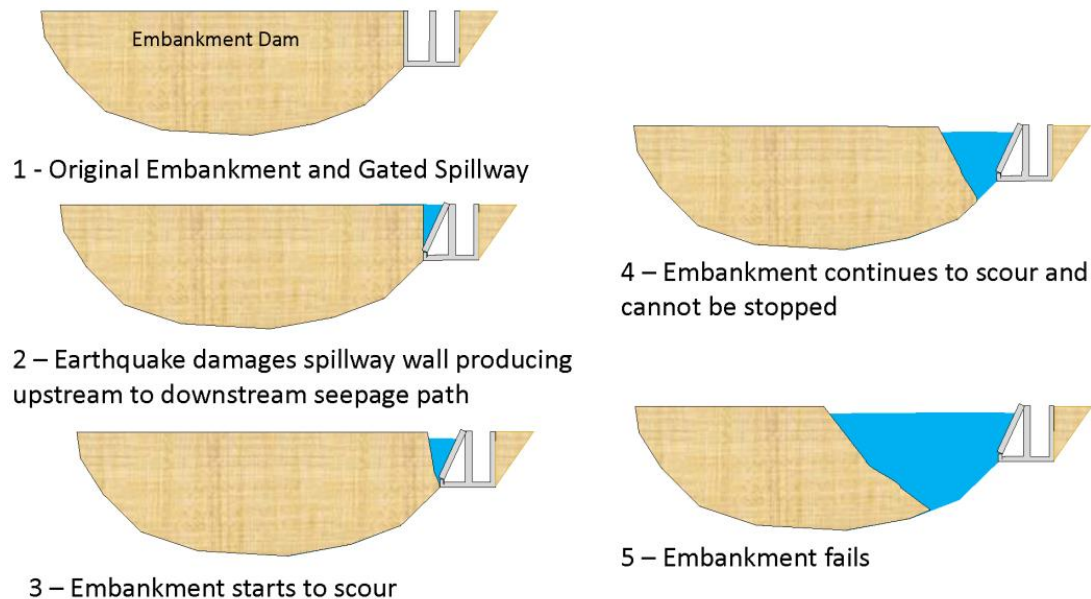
Spillway Crest Structure Adjacent to Embankment Dam
